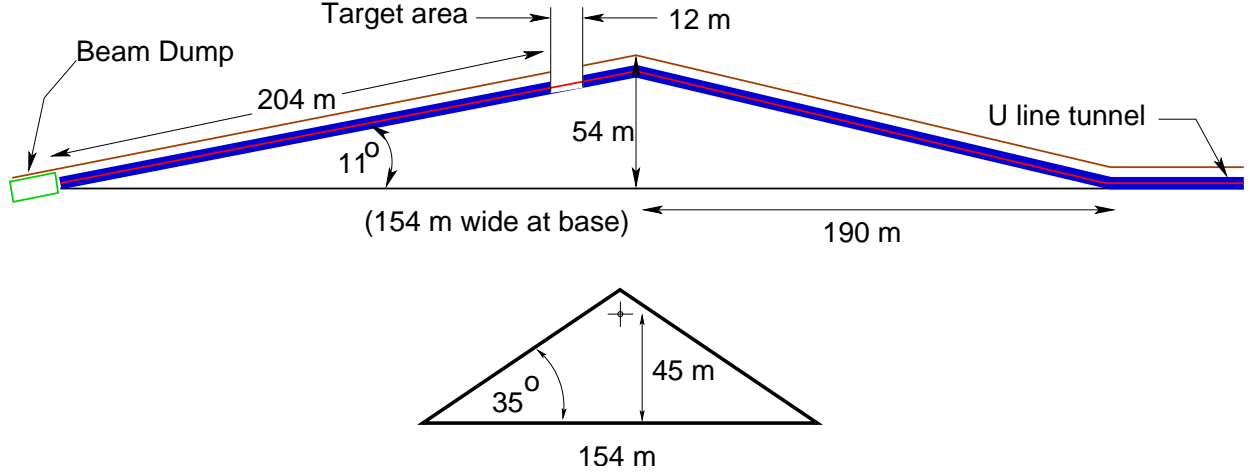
Elevation view of the neutrino beam line to Homestake, South Dakota. For a nearer location a much smaller hill can be constructed. In this beam we assume a decay tunnel length of 200 m. For a shorter tunnel the cost of the hill will reduce as shown in Table 5.
